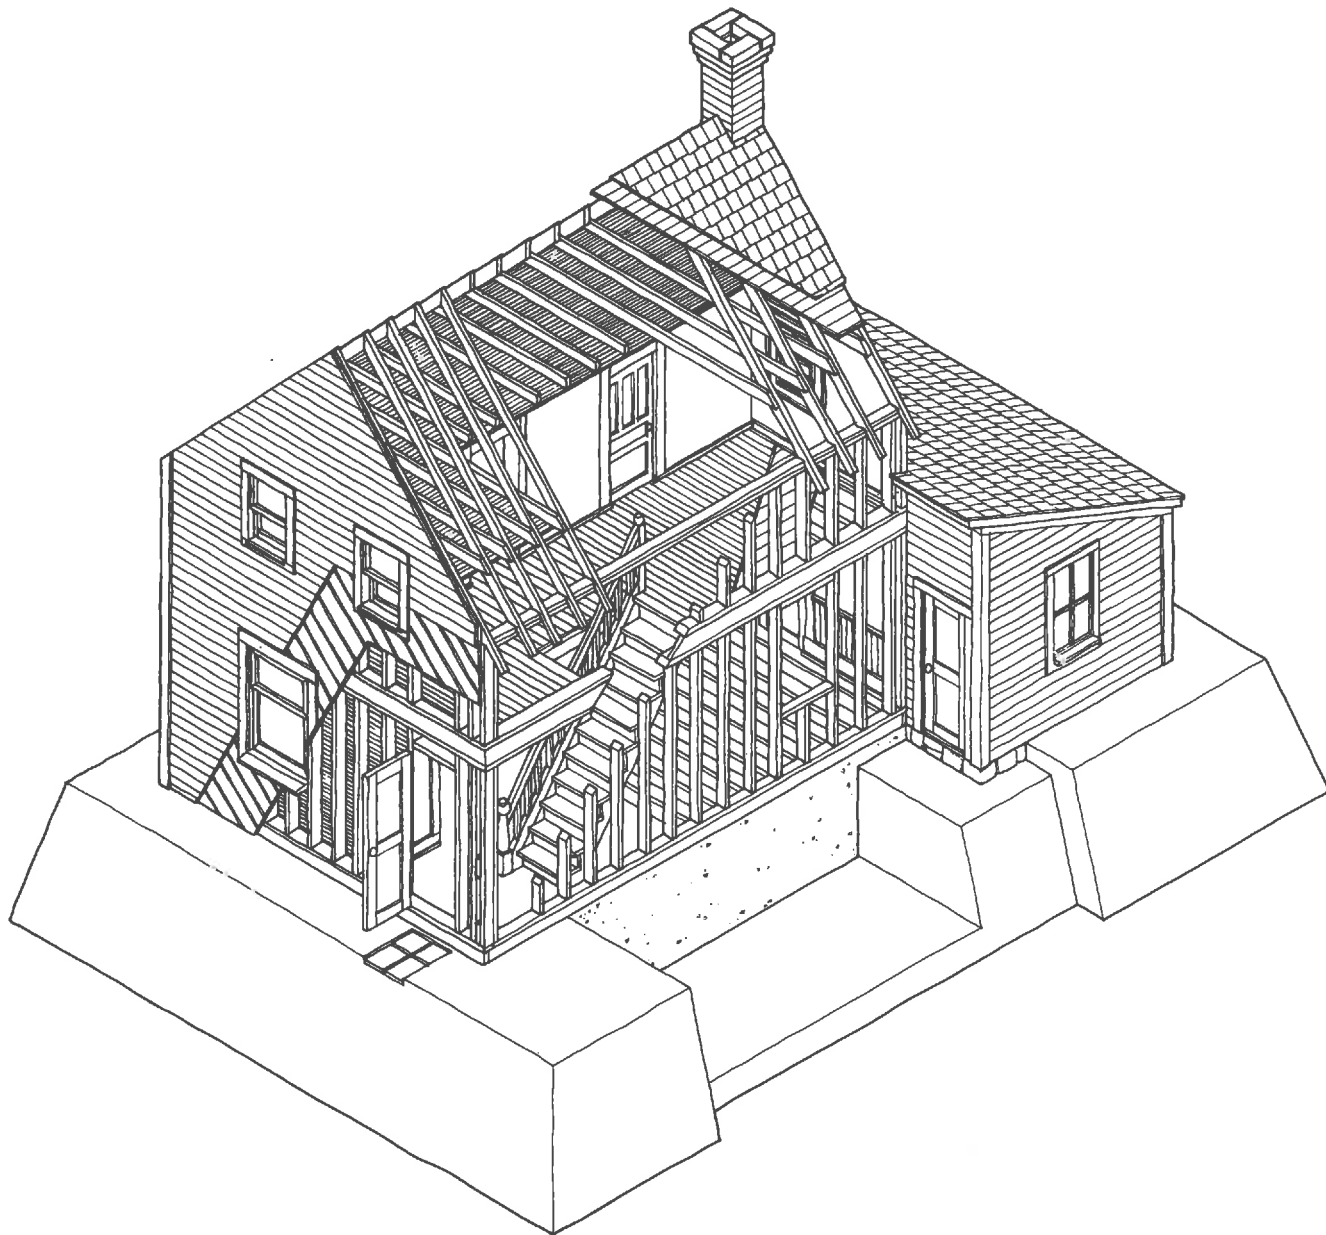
Isometric cut-away view of the former MacArthur house. The ground on which the building sits has been removed on one side to reveal the concrete foundation under the house and the much shorter stone foundation under the shed. The construction procedures used with light wood frame are evident here: the regularly spaced wall studs, floor joists and roof rafters; and the interior wall lath, exterior rough diagonal sheathing and, over that, finished cove siding.
